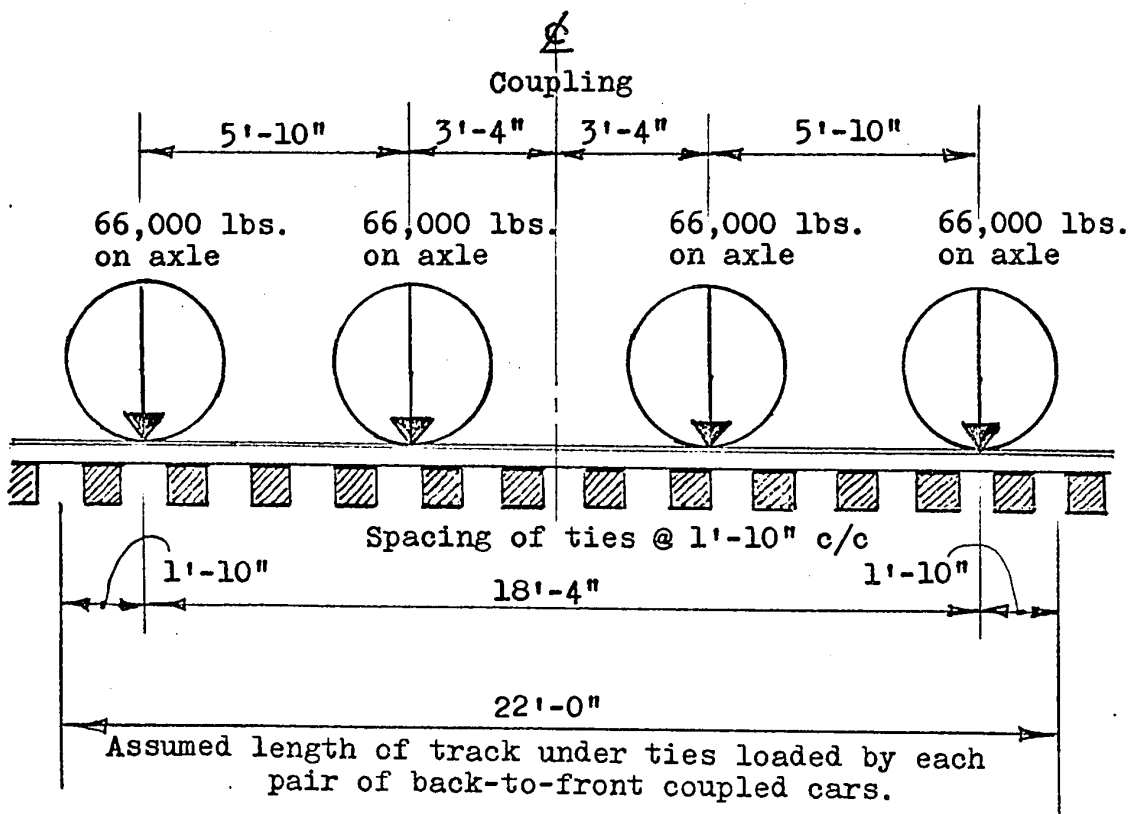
(b) Axle loadings and spacing of back-to-front coupled cars.
